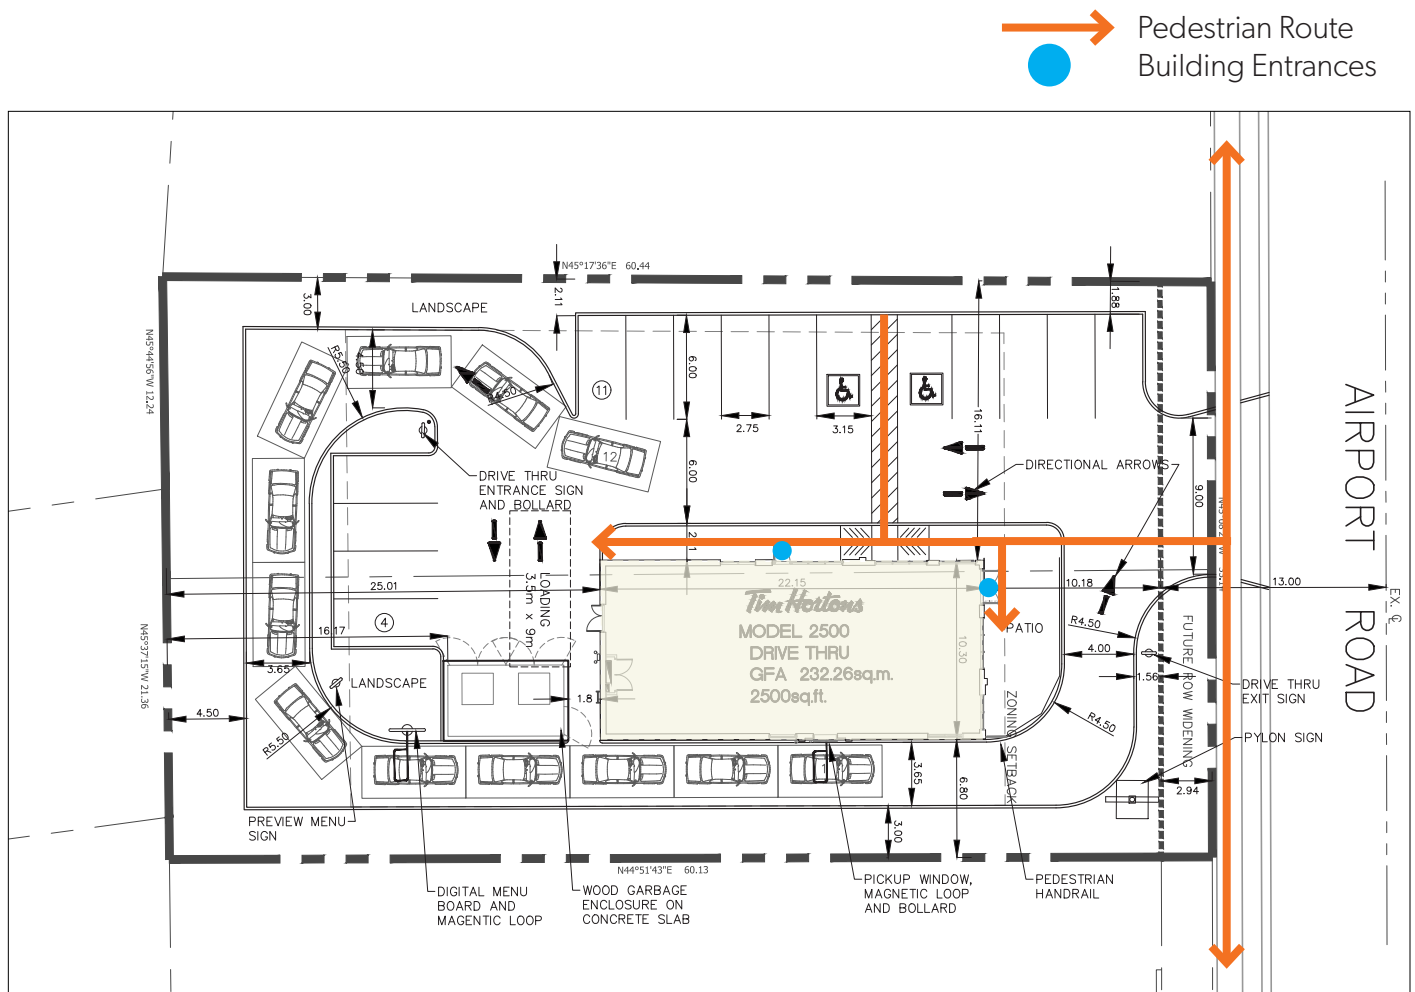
Proposed Site Plan illustrating pedestrian route and building entrances
